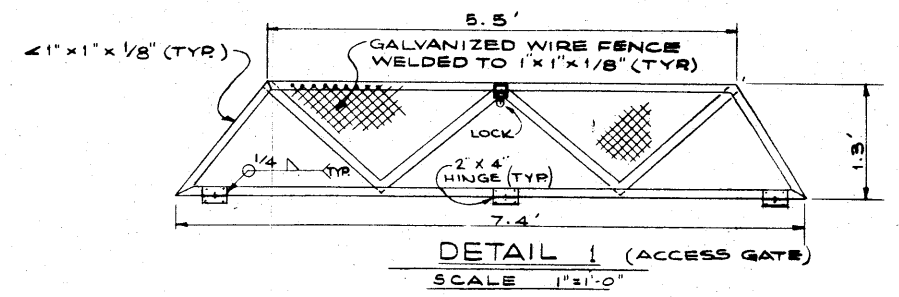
DETAIL OF EI ENTRY (BEFORE CONSTRUCTION)
